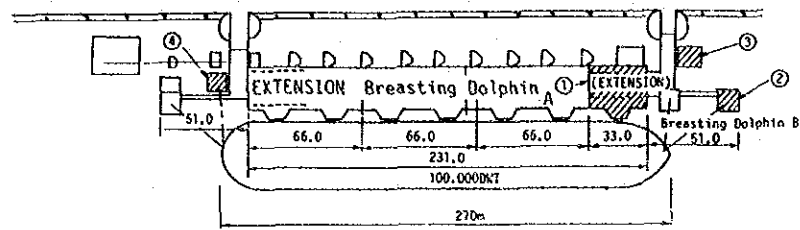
Augmentation Plan of the Iron Ore Berth
